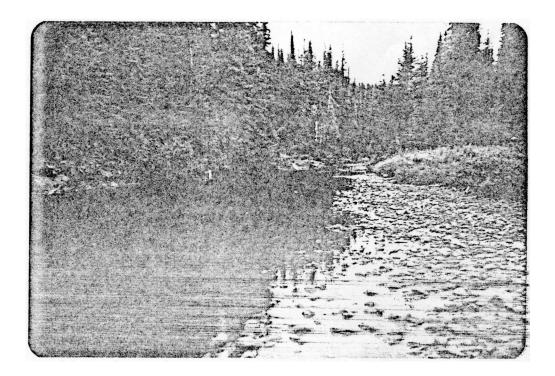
Proposed bridge crossing site on North Fork (Cox Creek) of Gosnell Creek. (August 13, 1980)
